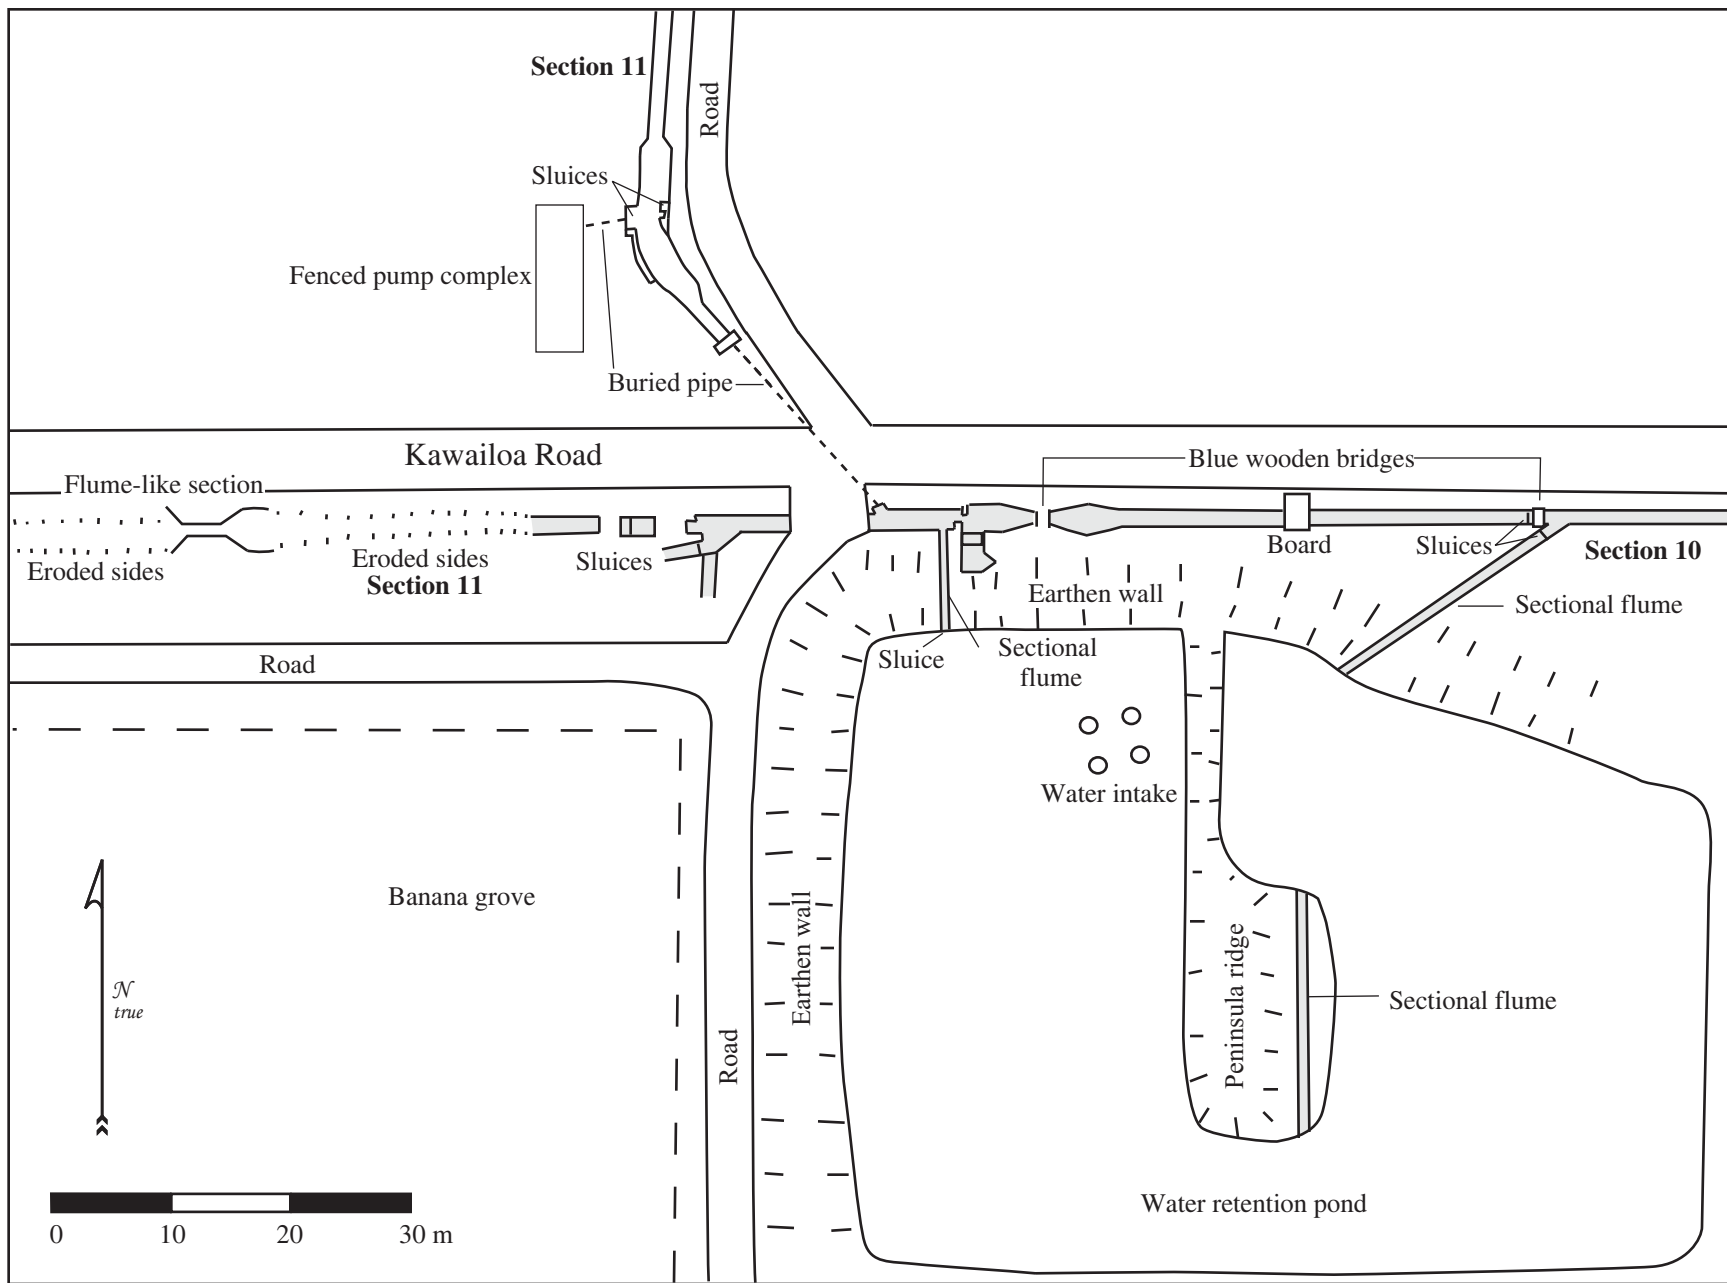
Site 7159 Sections 10 (west end) and Section 11 (east end) plan view showing sluice gate complexes.
